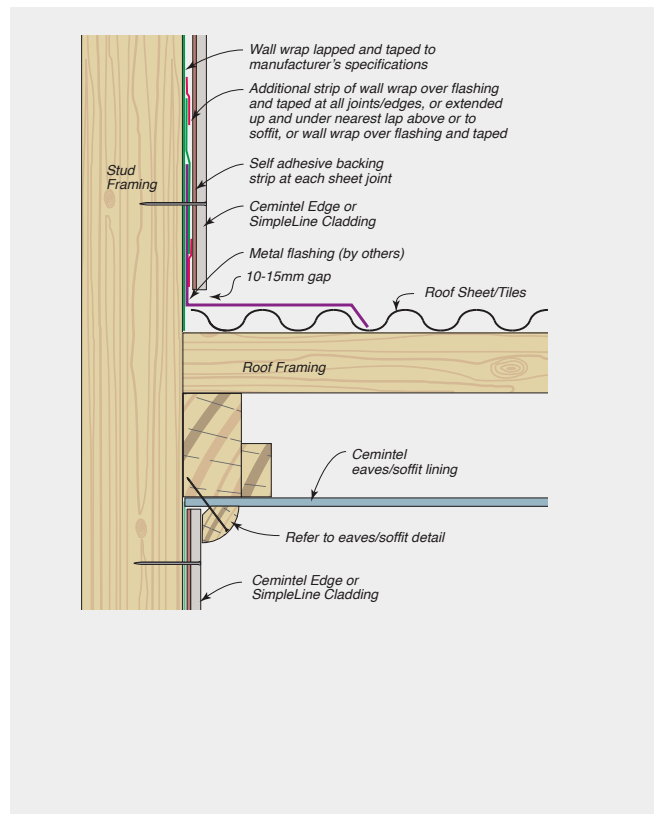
Junction of Cladding with External Parallel Roofing
